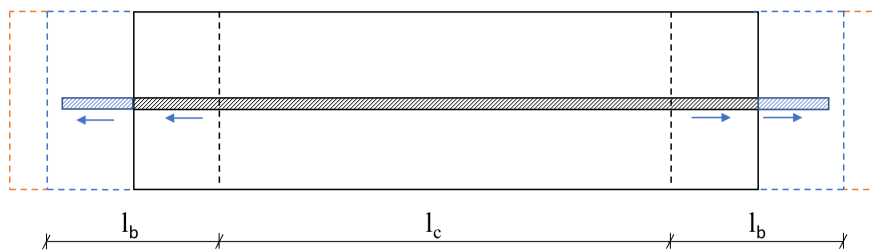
Expansion of a beam with reinforcement placed in center of gravity
